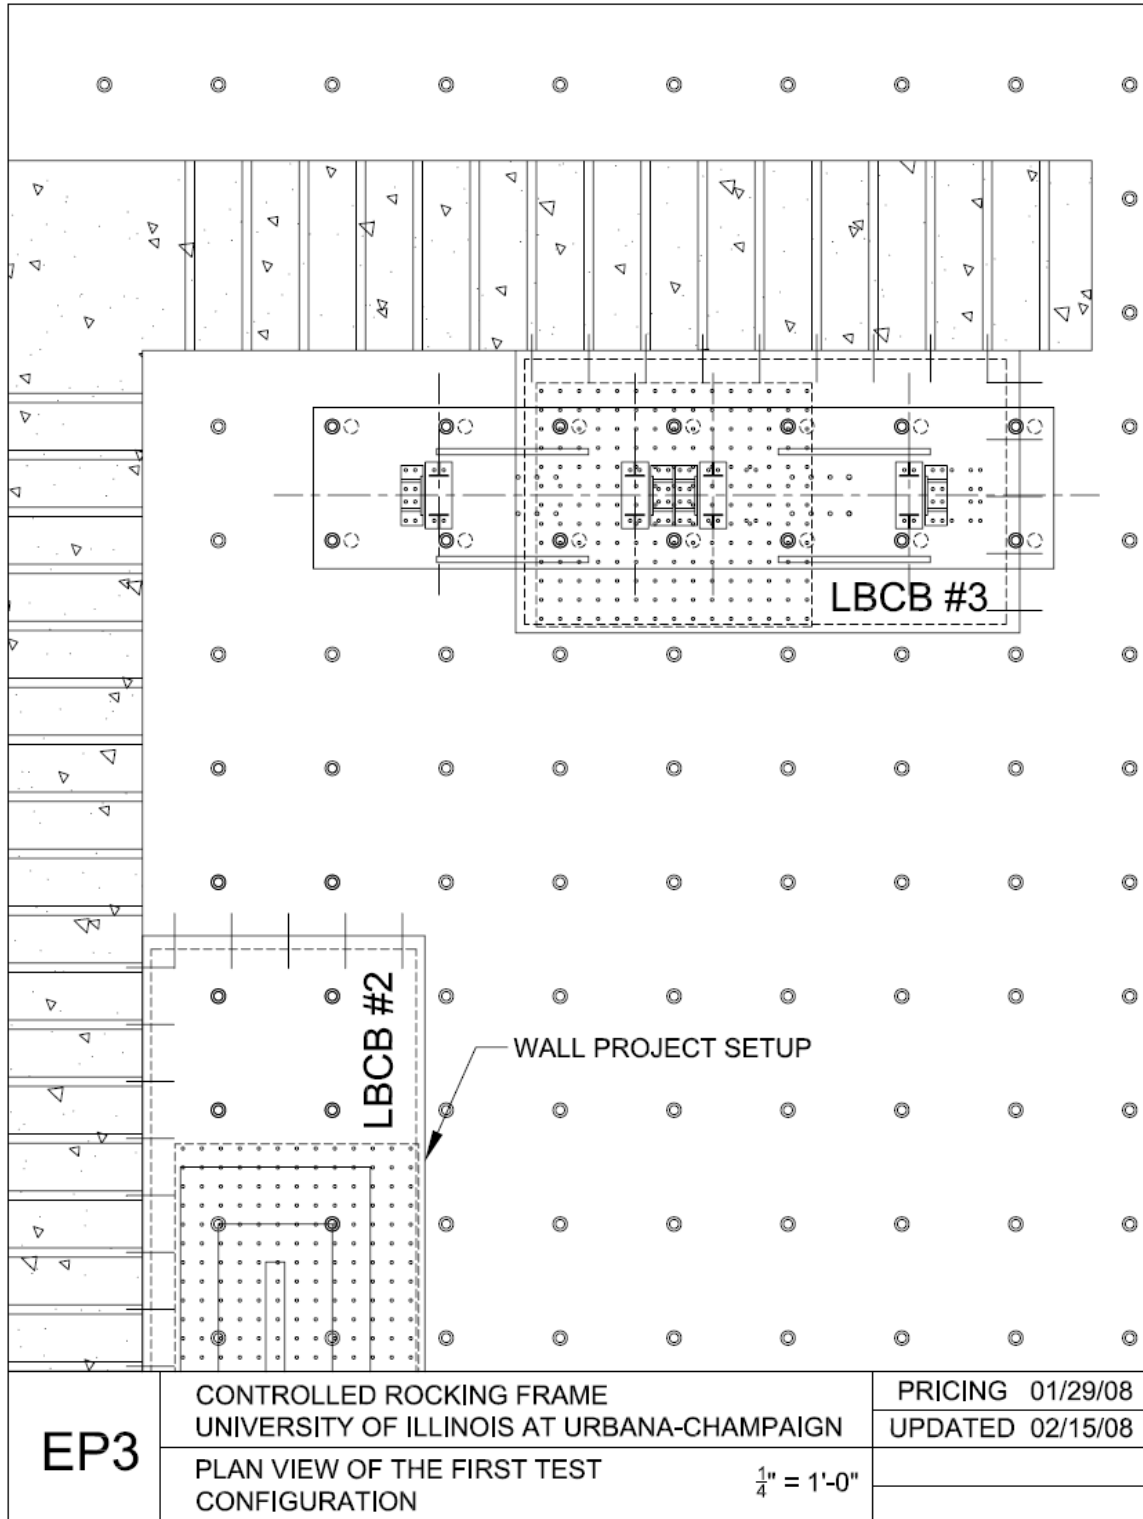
Erection Plan Drawing – Plan View for Specimen A1
